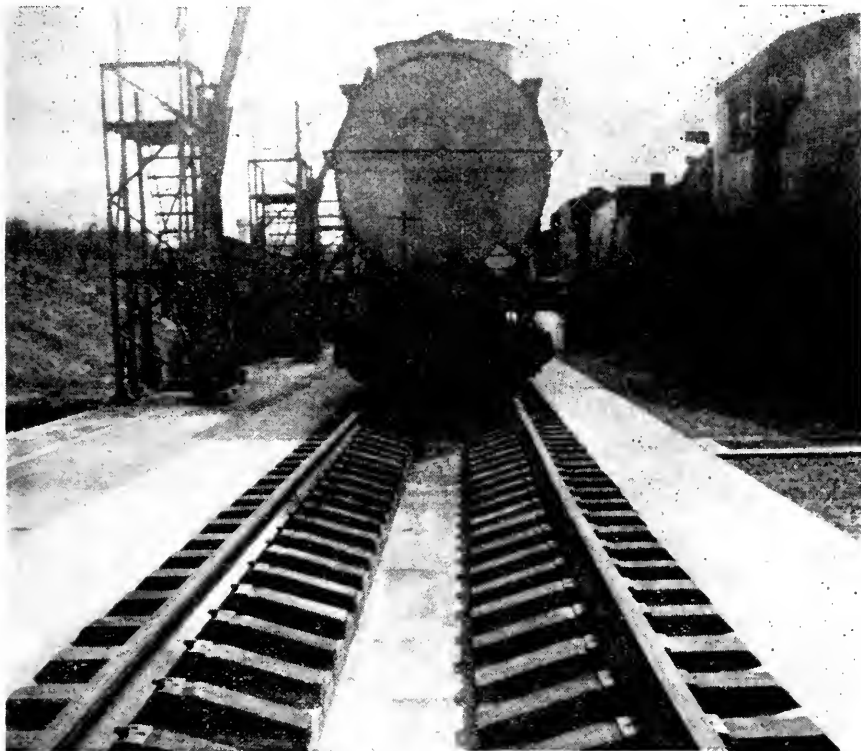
Concreted roadway with collecting trough sloped to a sump, using stub ties for rail support.
